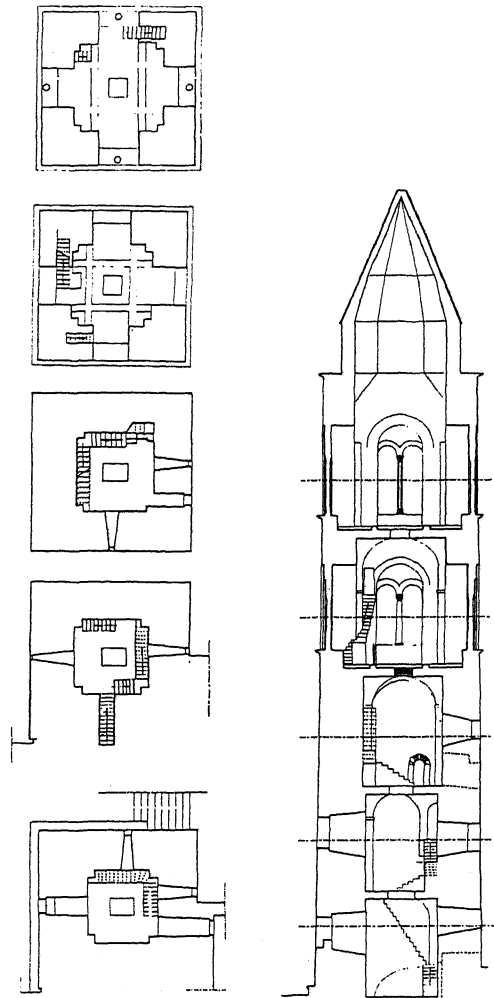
Horizontal and vertical sections of the Bell-Tower.
